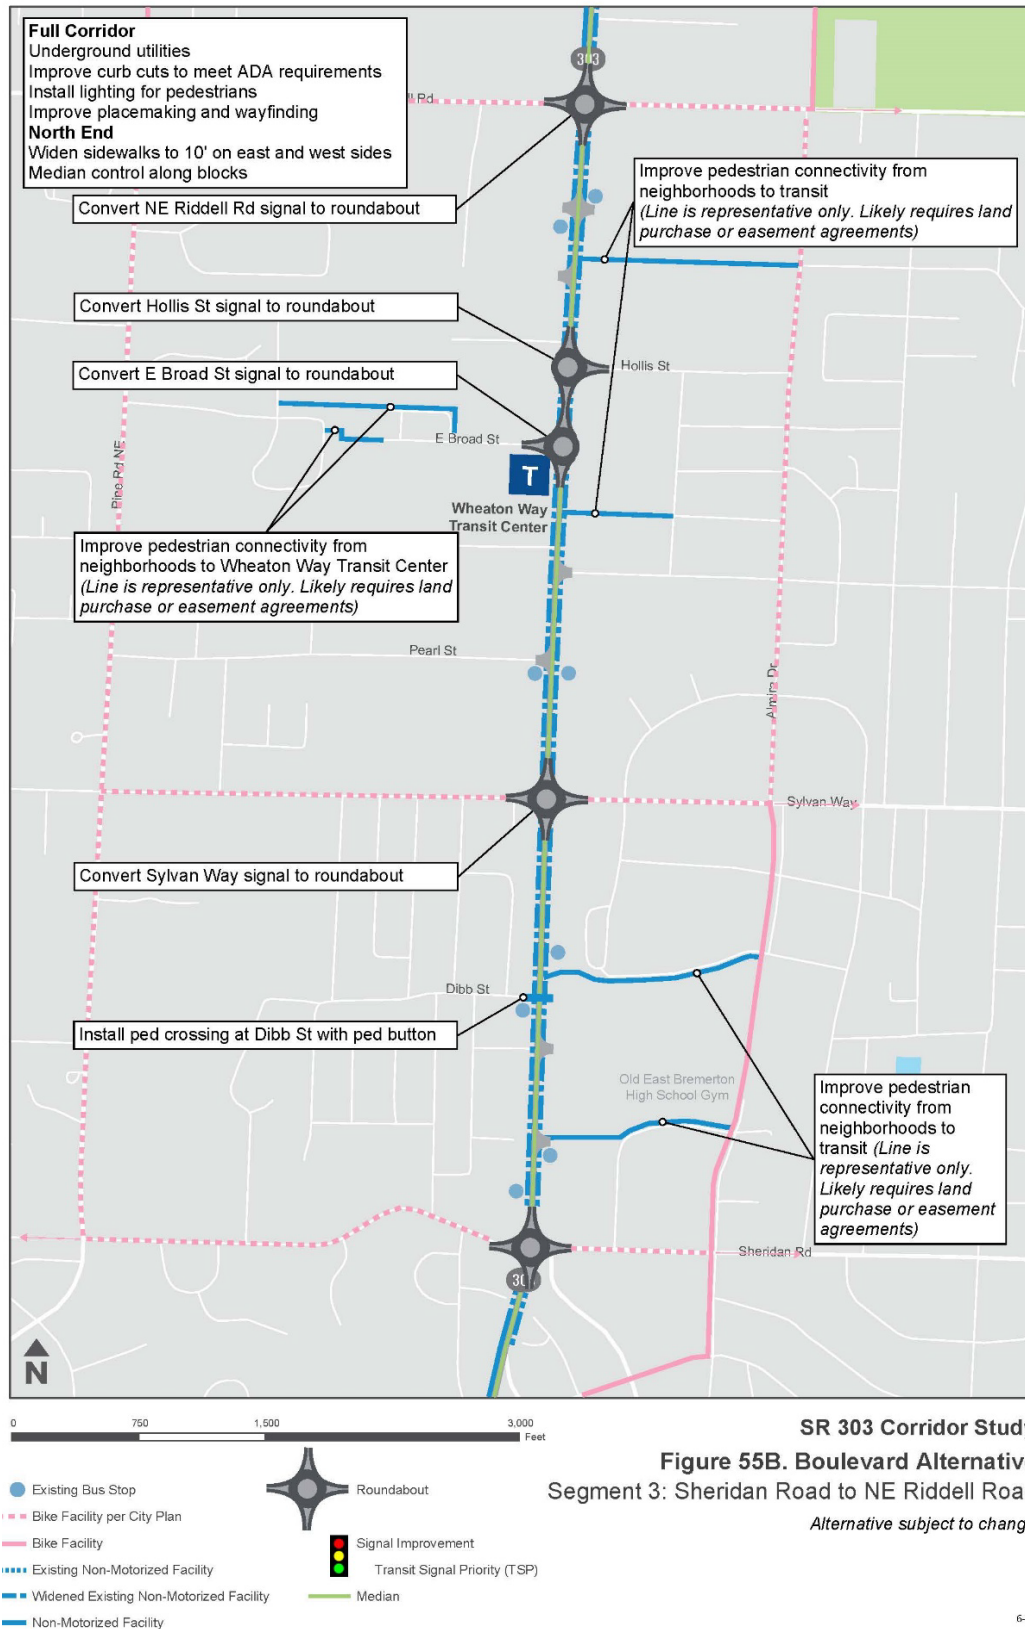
SR 303 Corridor Concept Sheridan Road to Riddell Road Section
